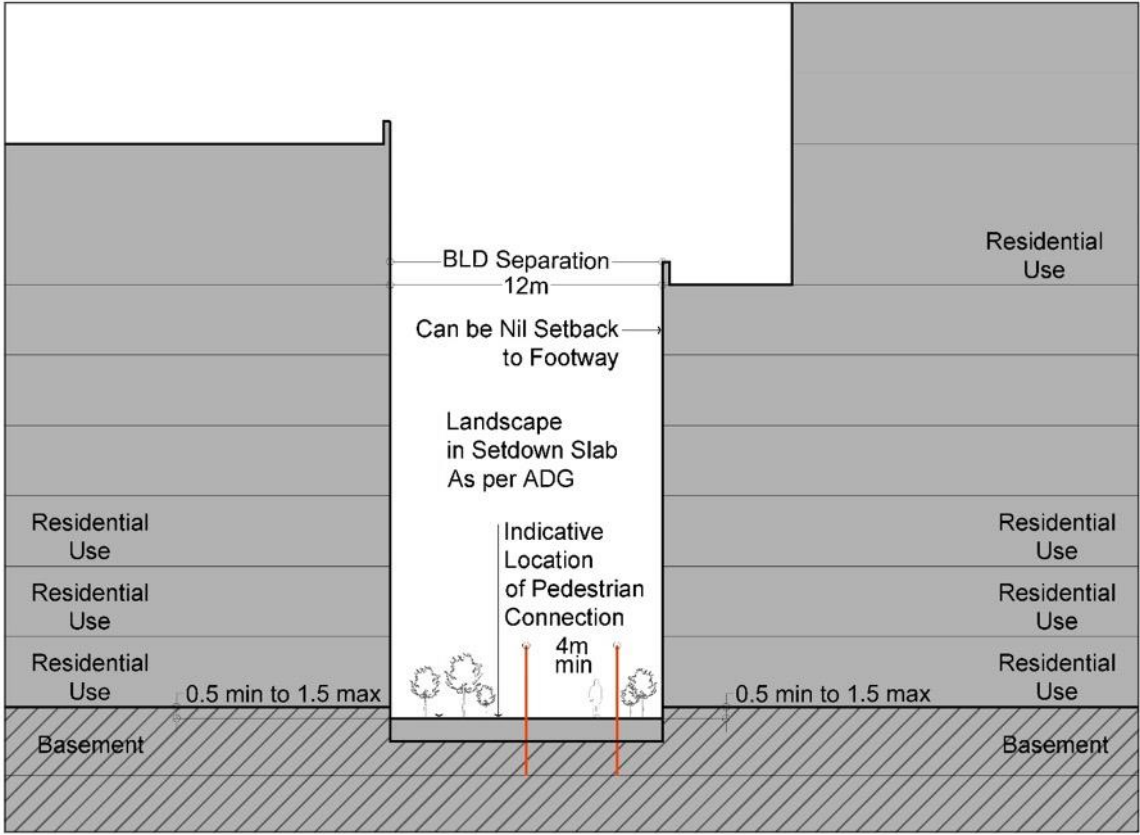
Street Wall Height at Pedestrian Connection, NTS
